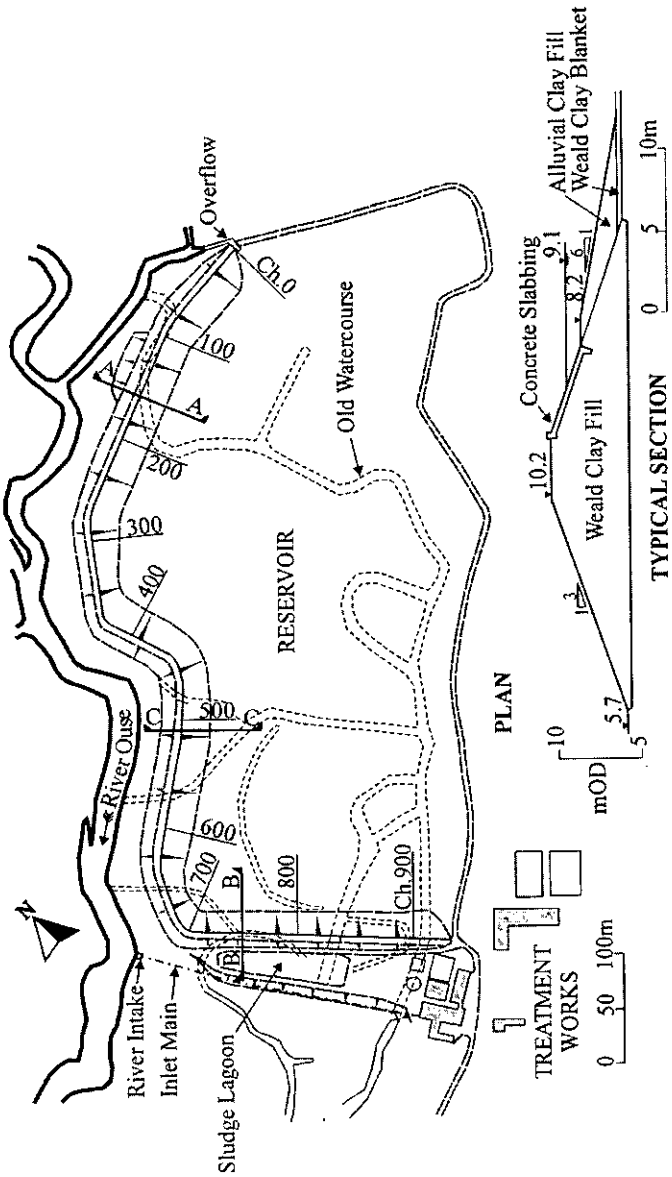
Barcombe Reservoir - Layout and typical embankment section
